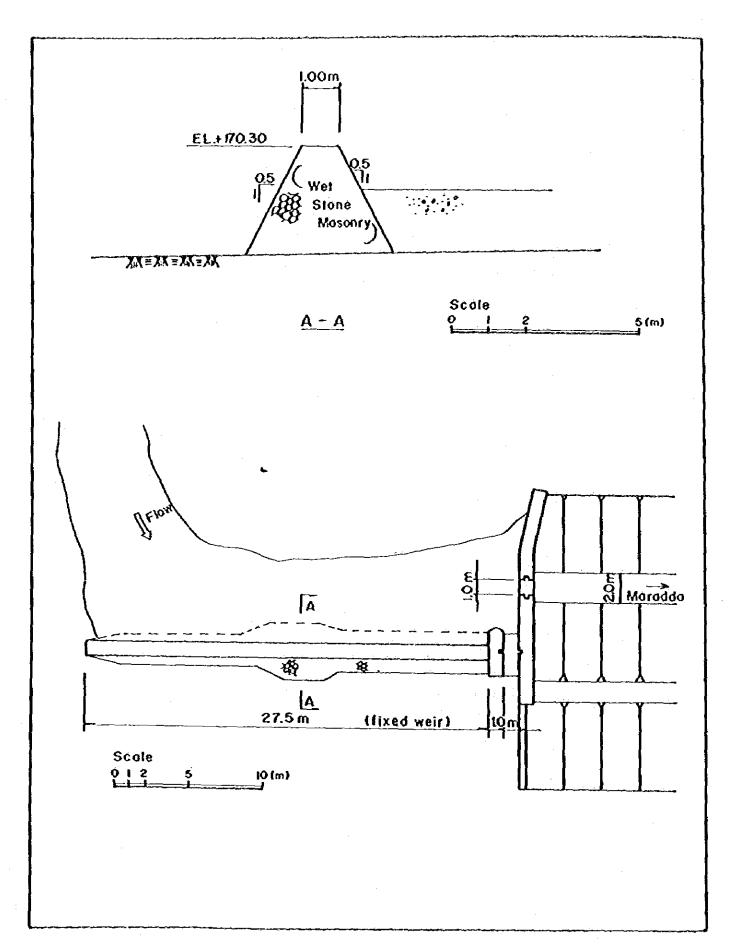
TYPICAL SECTION OF BIRU INTAKE WEIR
